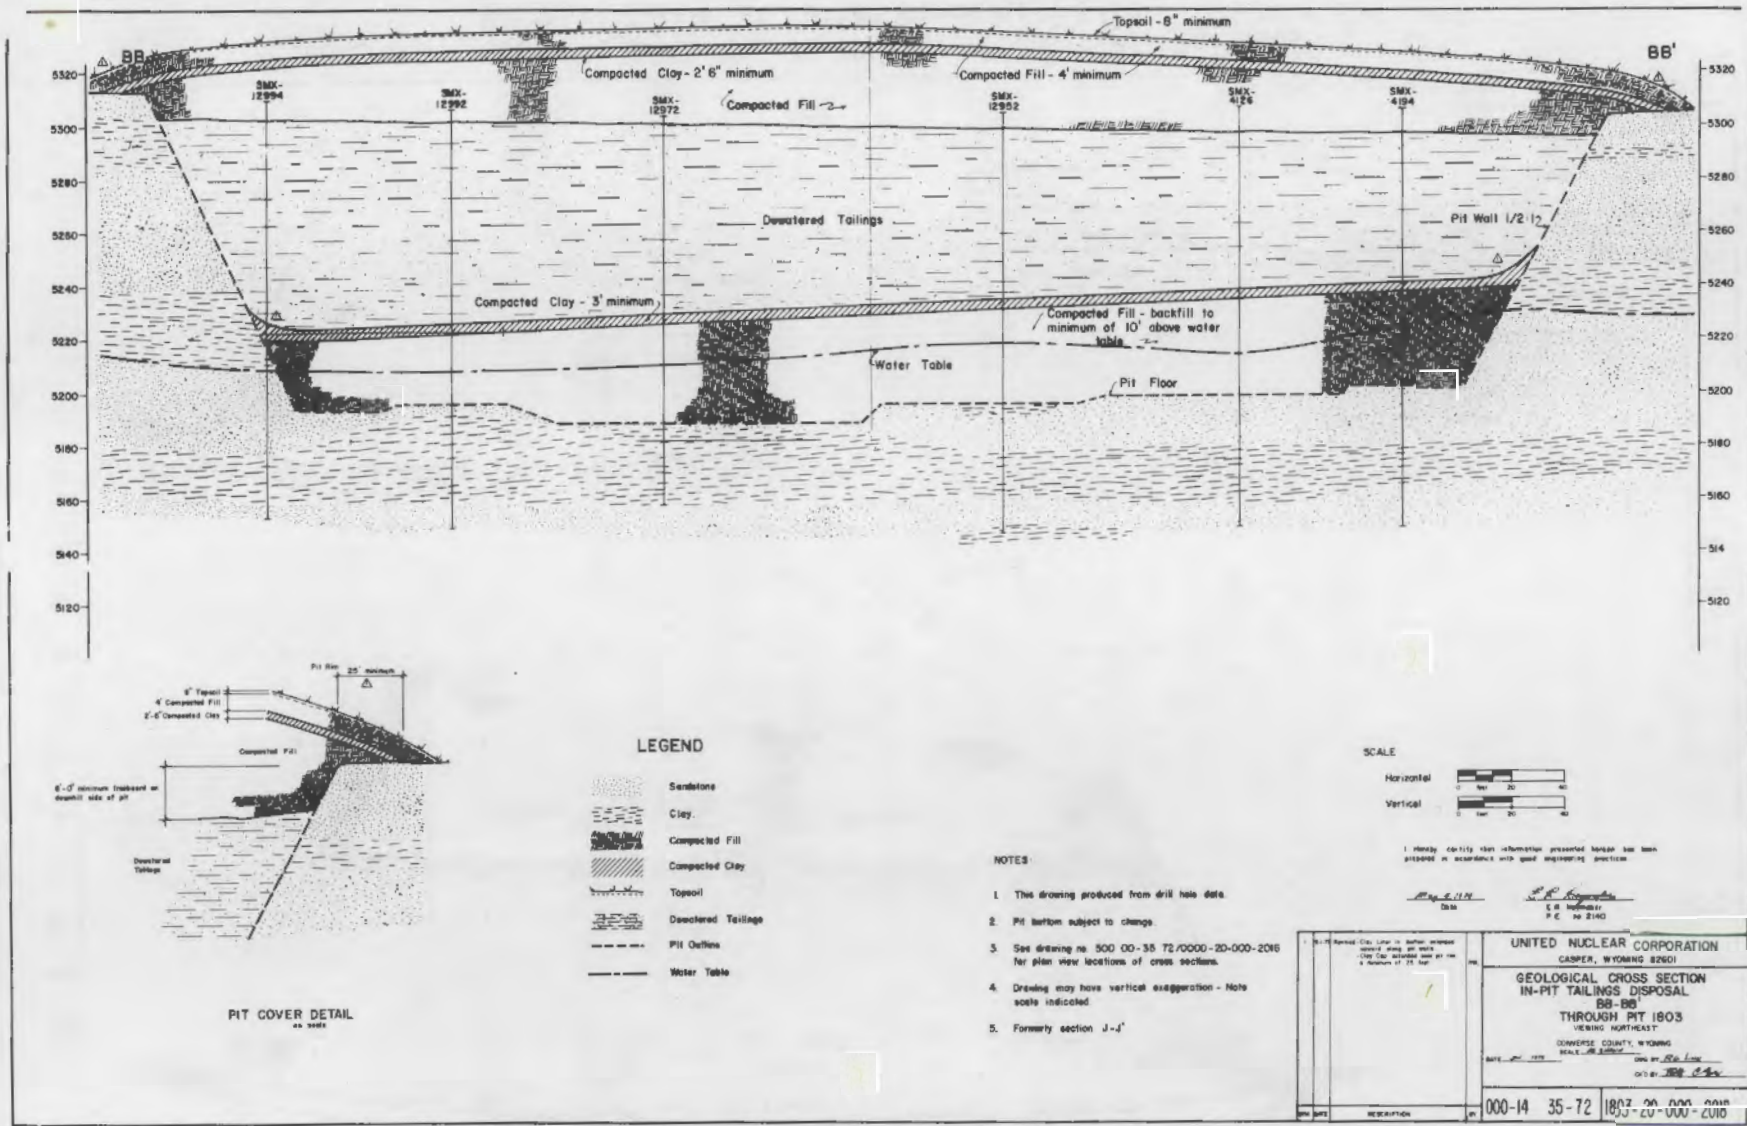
Geologic Cross Section BB' of Proposed Pit Tailings Disposal at Morton Ranch Mill Site
